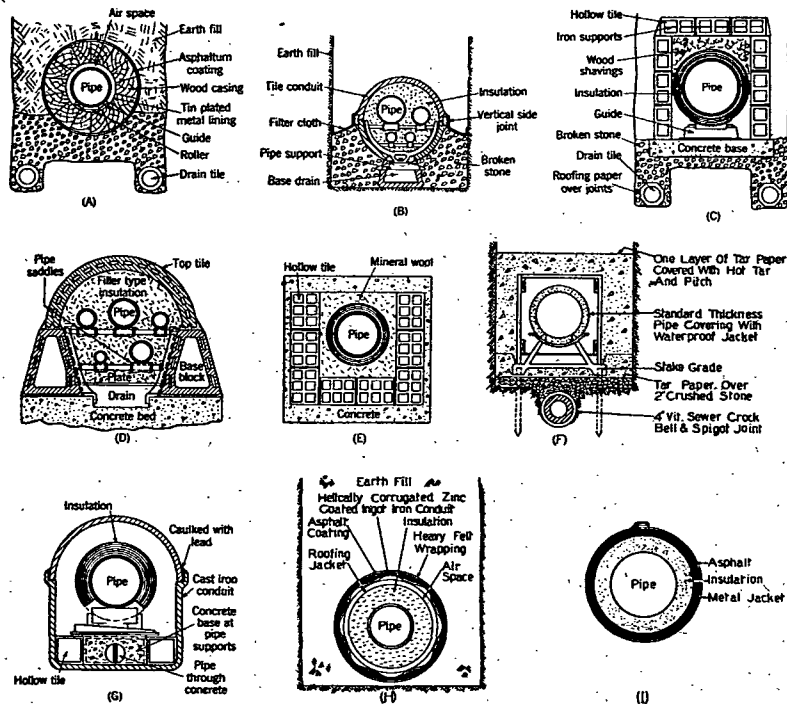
CONSTRUCTION DETAILS OF CONDUITS COMMONLY USED
